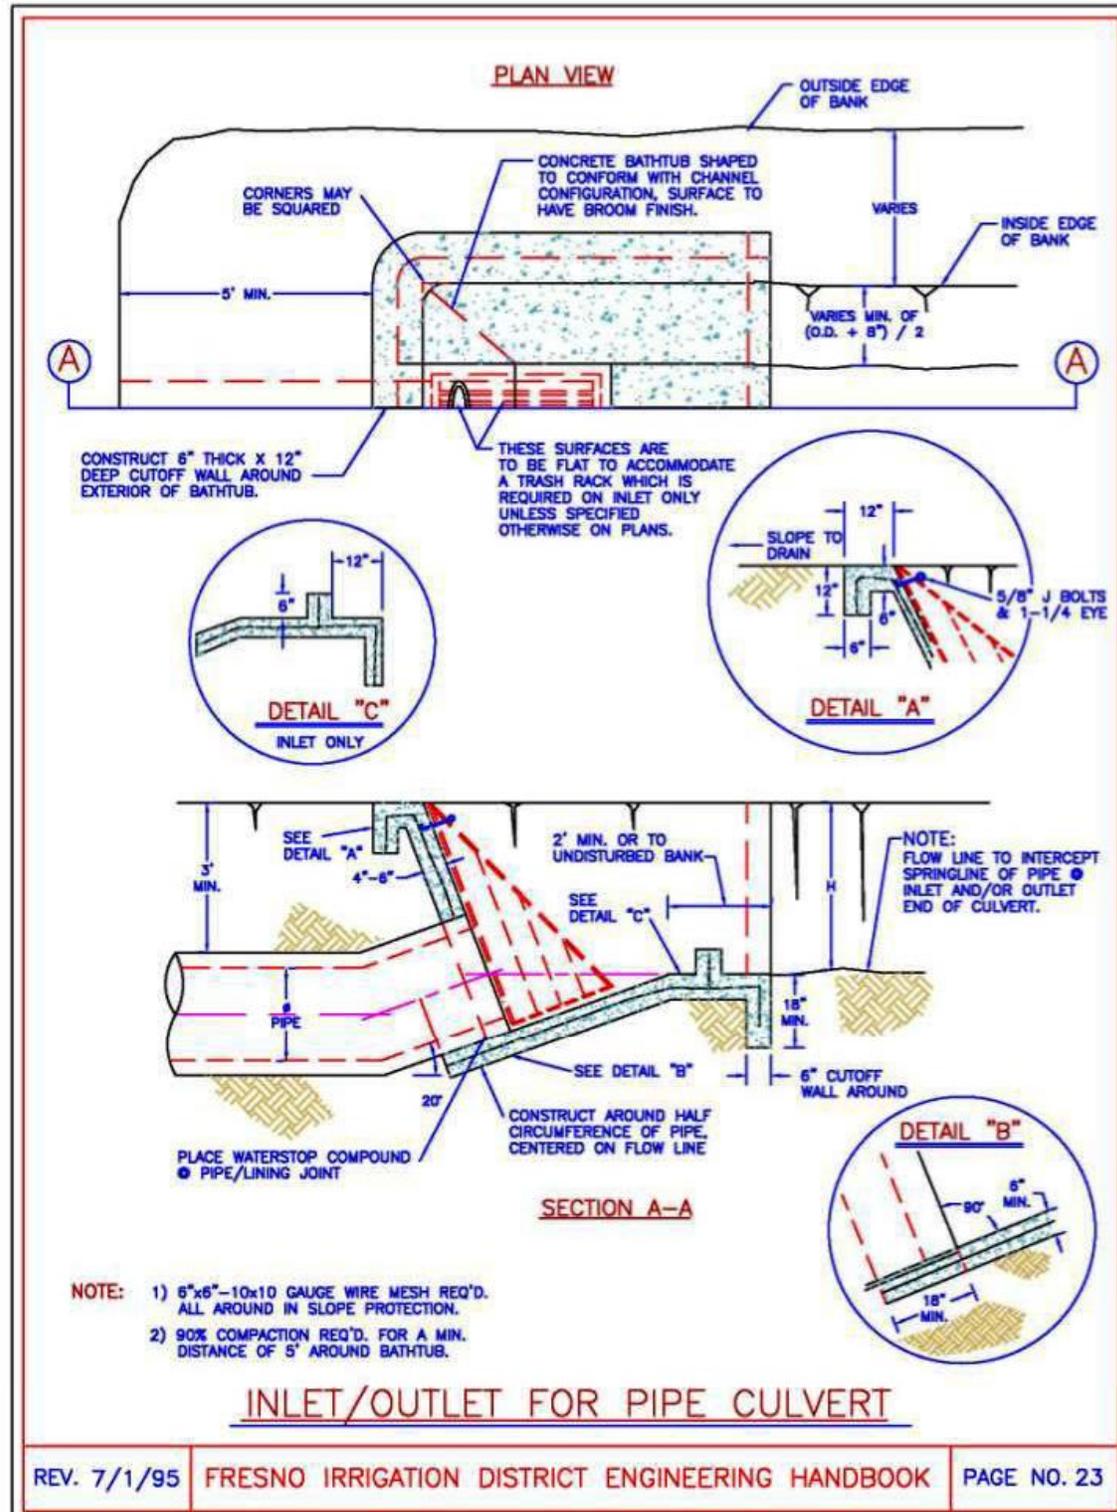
Sample Standard Plan for Driveway Culvert
